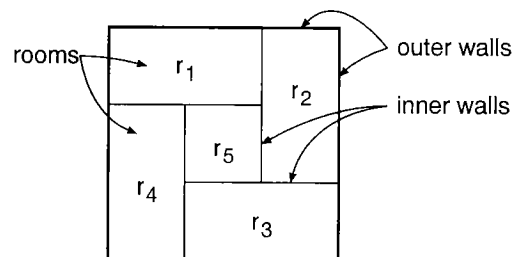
Definitions of floor-rectangle, rooms, and walls.
